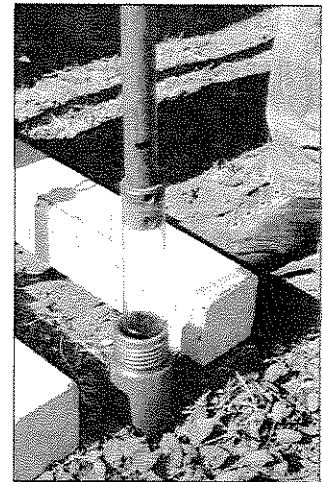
Lower liner to bottom of outer casing on leading end of inner rods.
